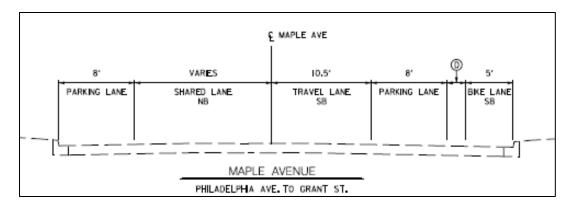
Typical Section - Philadelphia Avenue to Grant Avenue
